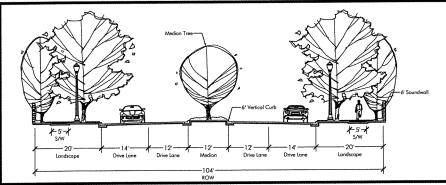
Arterial Road - Union Road North of Community Entry, Section K
